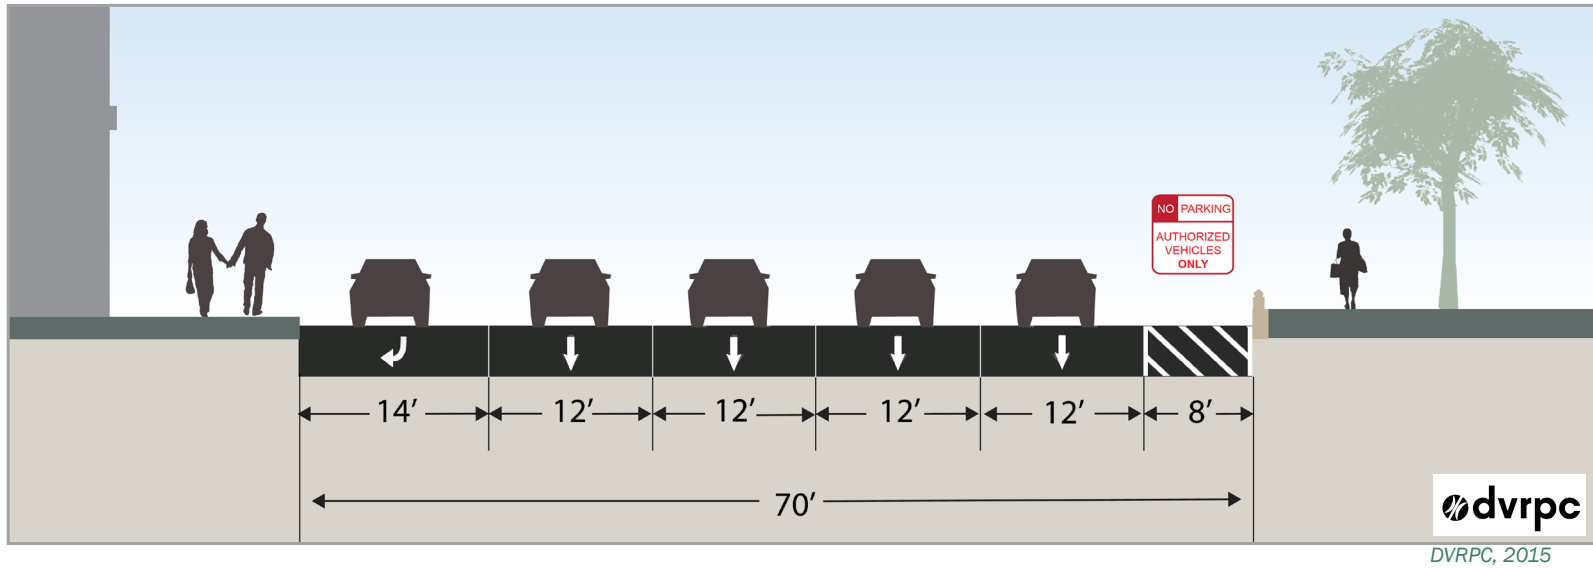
Proposed Design Cross-Section–Race at 6th Street looking west
